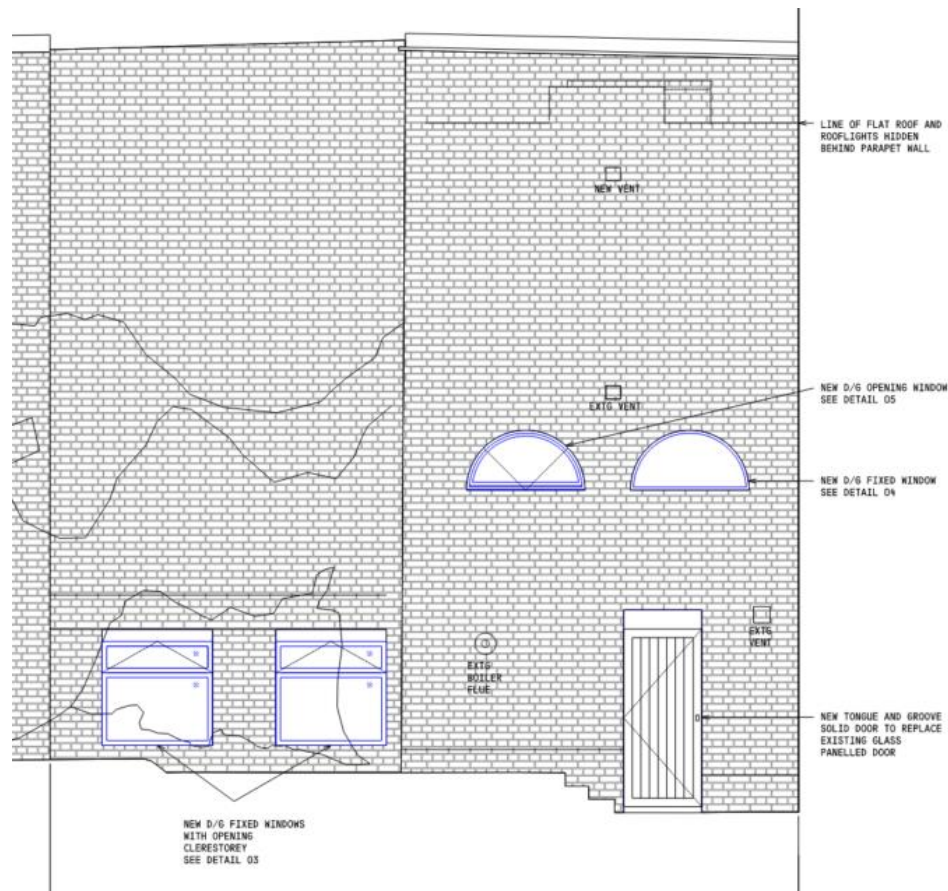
Proposed rear elevation, indicating replacement windows in blue.
